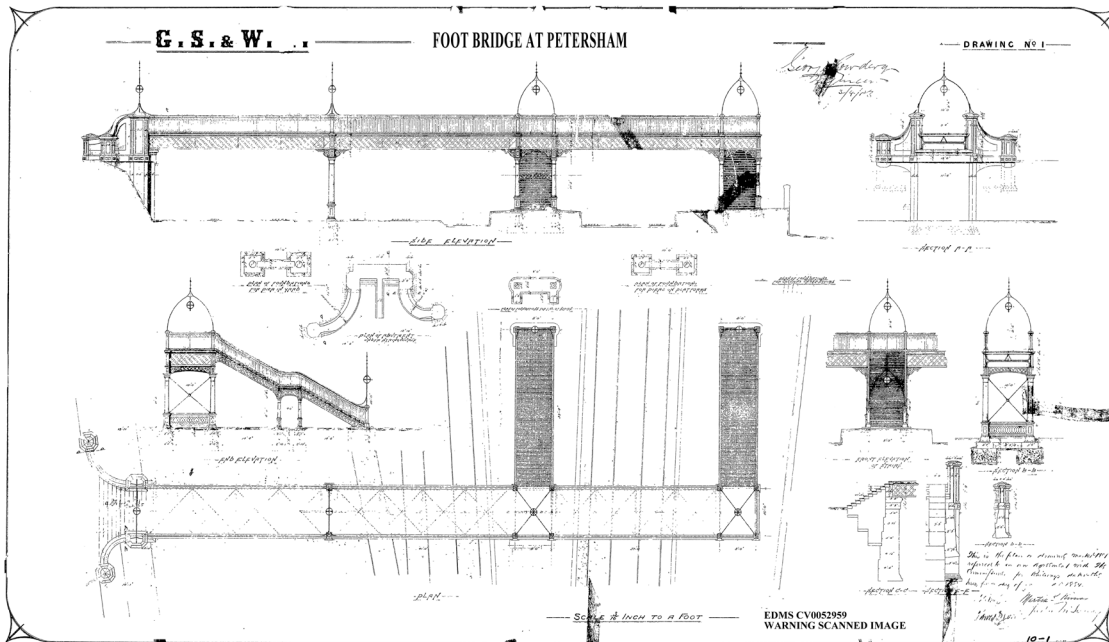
Footbridge at Petersham Station plan. Source: TfNSW
